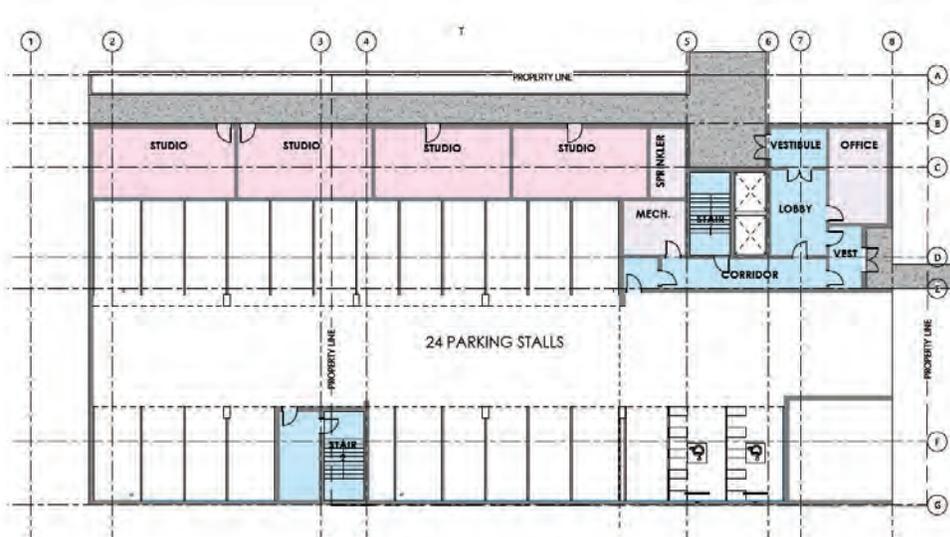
provides an overview of the proposed site plan. Vehicle access to the parking area will be from Cedar Street. There will be one ramp to Level 1 parking and one ramp to Level 2 parking from Cedar Street. The proposed building has been designed to accommodate for zamboni access and turn around to the arena at the rear of the proposed building.
